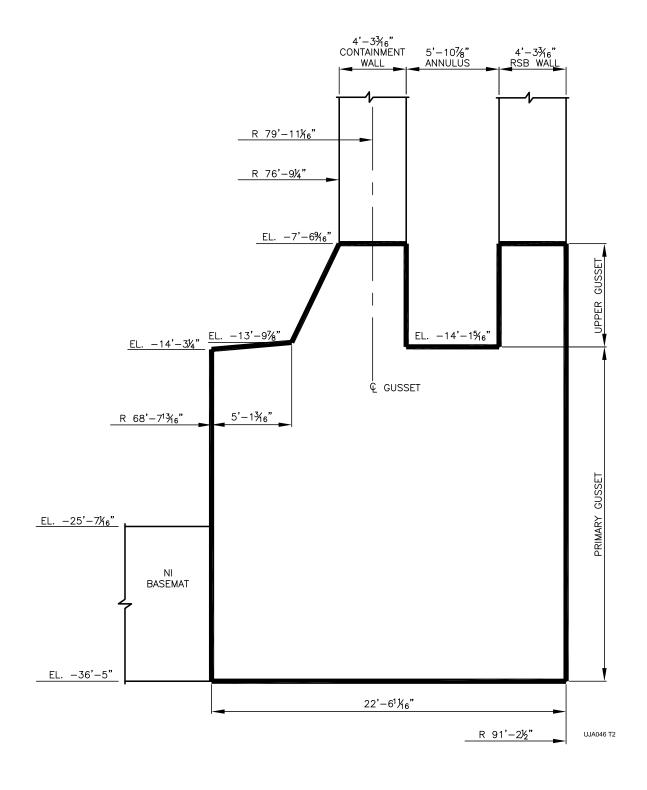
E.1-4—180° FEM Gusset Segment of Containment Foundation
